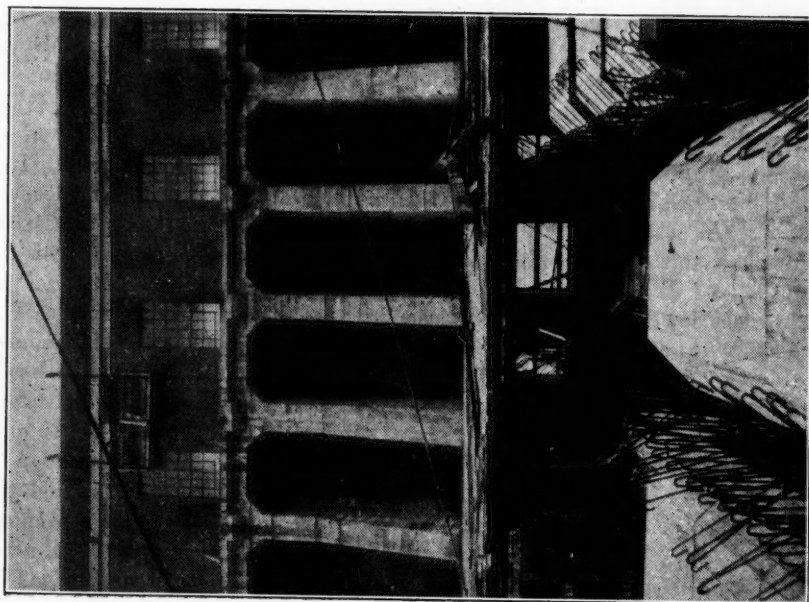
PENSTOCK FORMS, GATE-HOUSE IN BACKGROUND.
